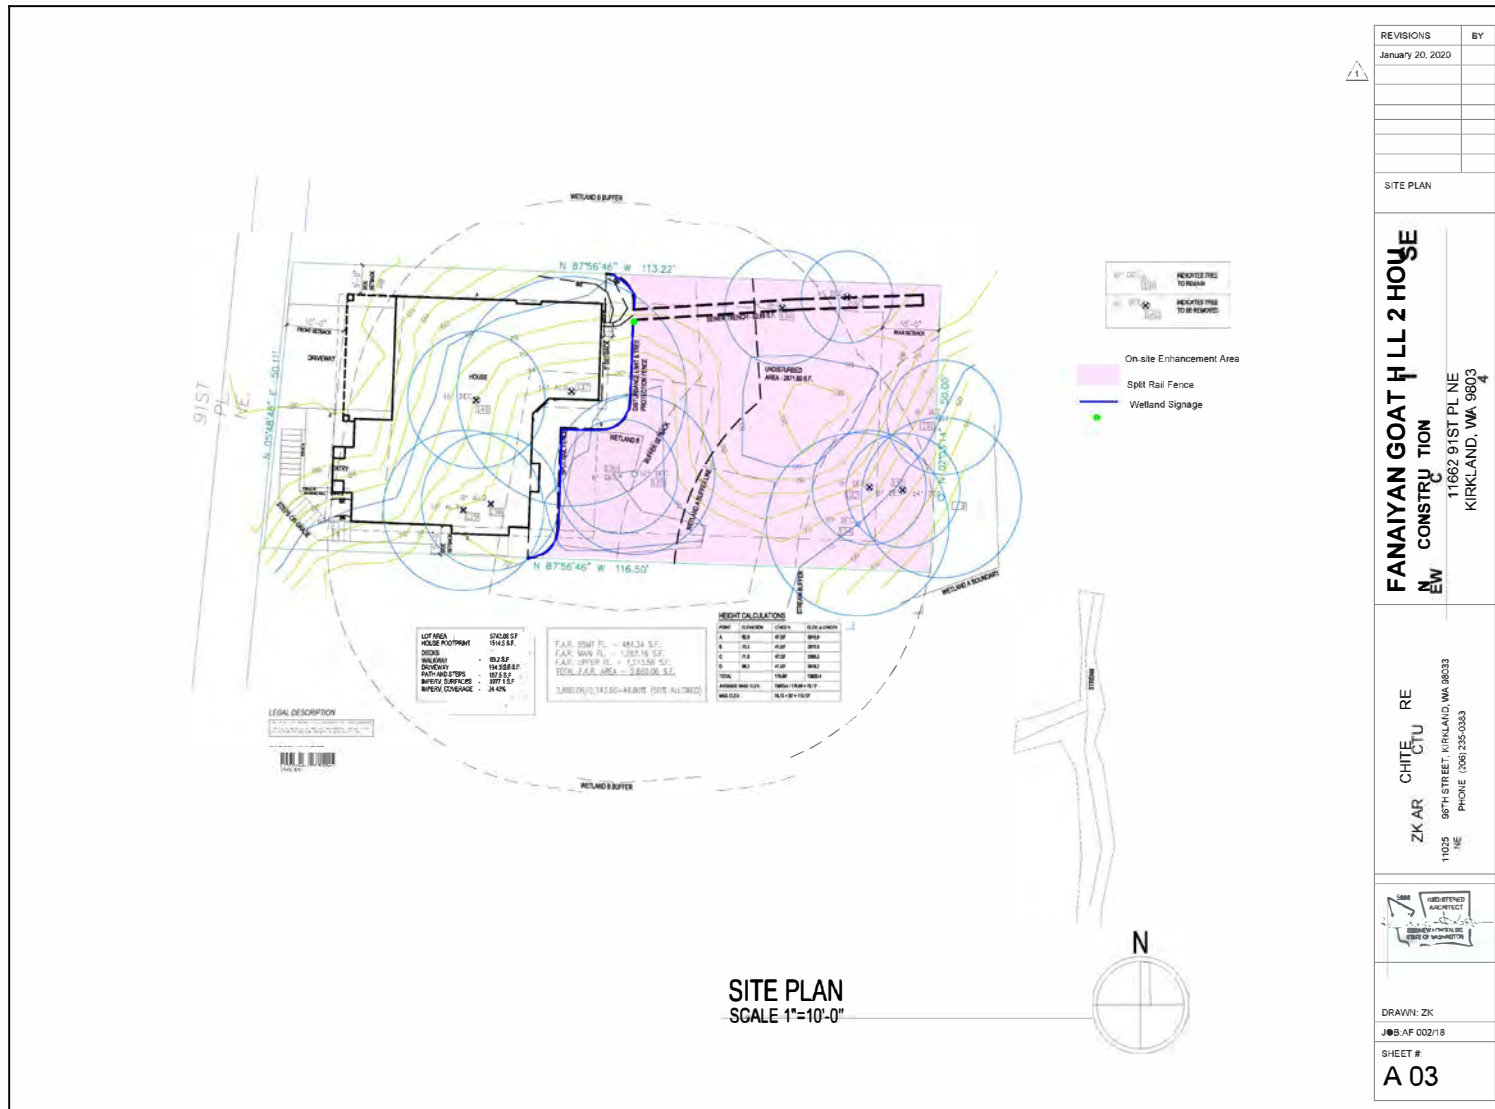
Revised Proposed Site Development Plan (Source: ZK Architecture, LLC 2022)
